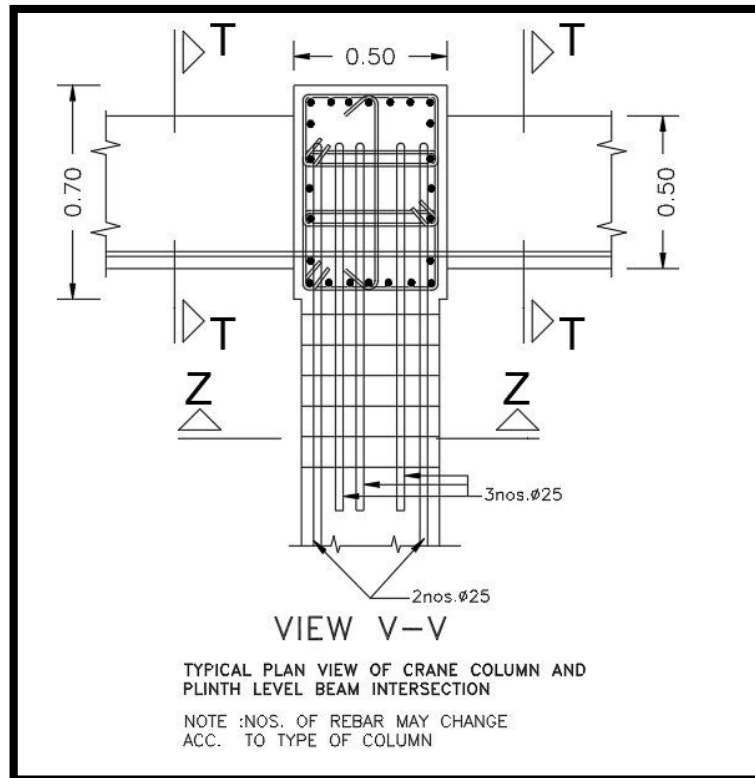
47 Typical plan view of crane column and plinth level beam intersection
